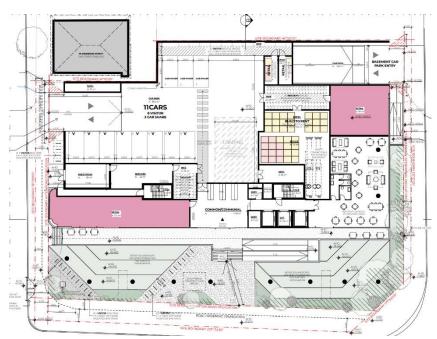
Proposed Ground Floor Plan – dated 10/11/23 (Source: Telha Clarke)
